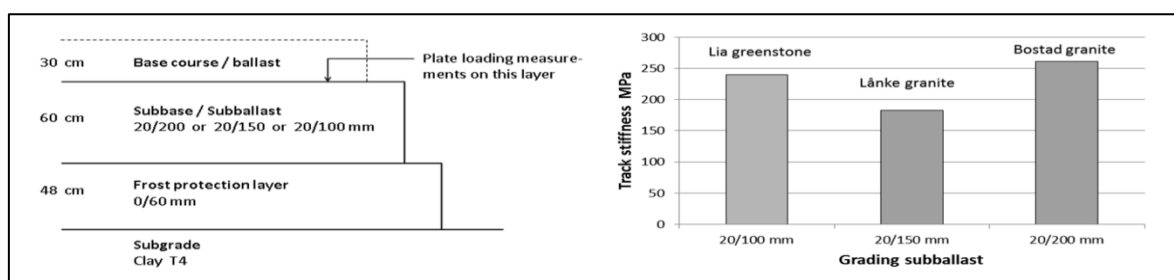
Purposed stiffness ranges from plate loading tests at highway E6, Trondheim-Stjørdal (From Nålsund, R, 2014)
